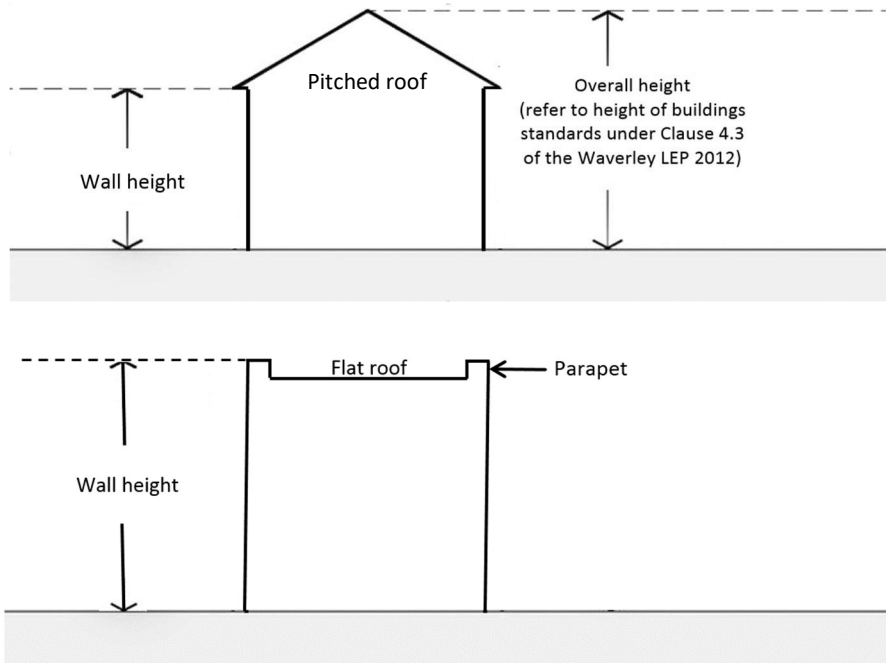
How to measure wall height for dwellings with pitched and flat roofs
